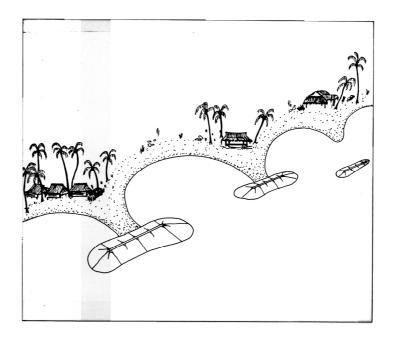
Stylised detached breakwaters leading to managed advance (SOPAC 1994).
